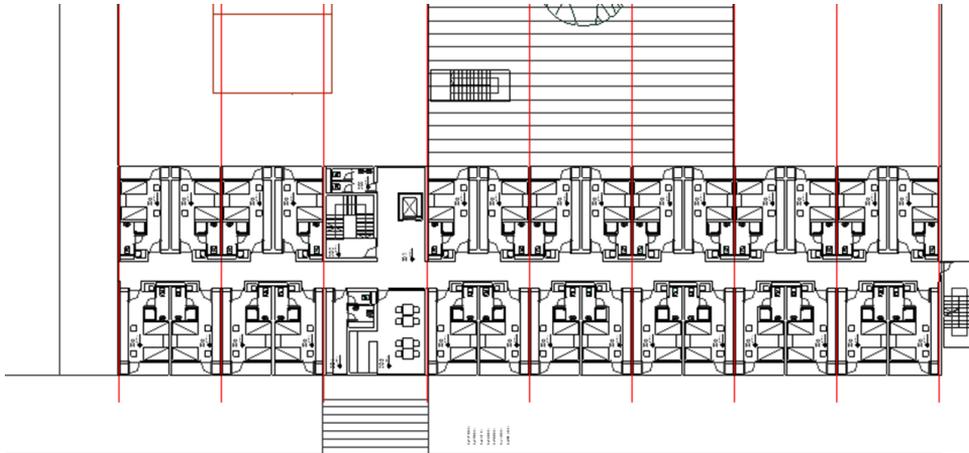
plan of student dorms , authors Saša Čvoro and Malina Čvoro
